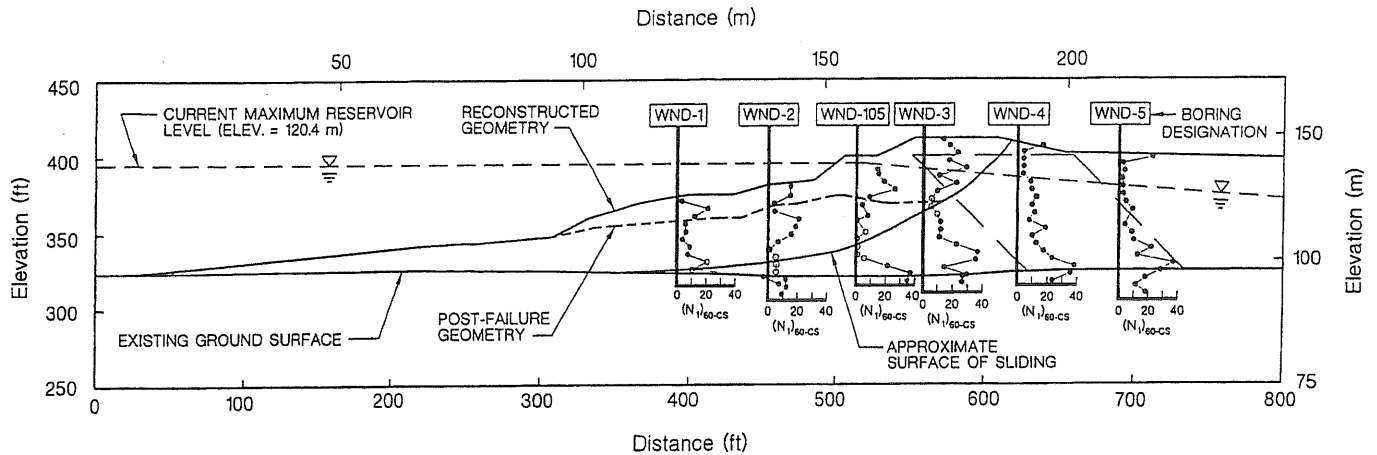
Reconstructed Cross Section of the North Dike of Wachusett Dam at Station 23+20 Showing the Locations and Results of Recent Standard Penetration Tests
